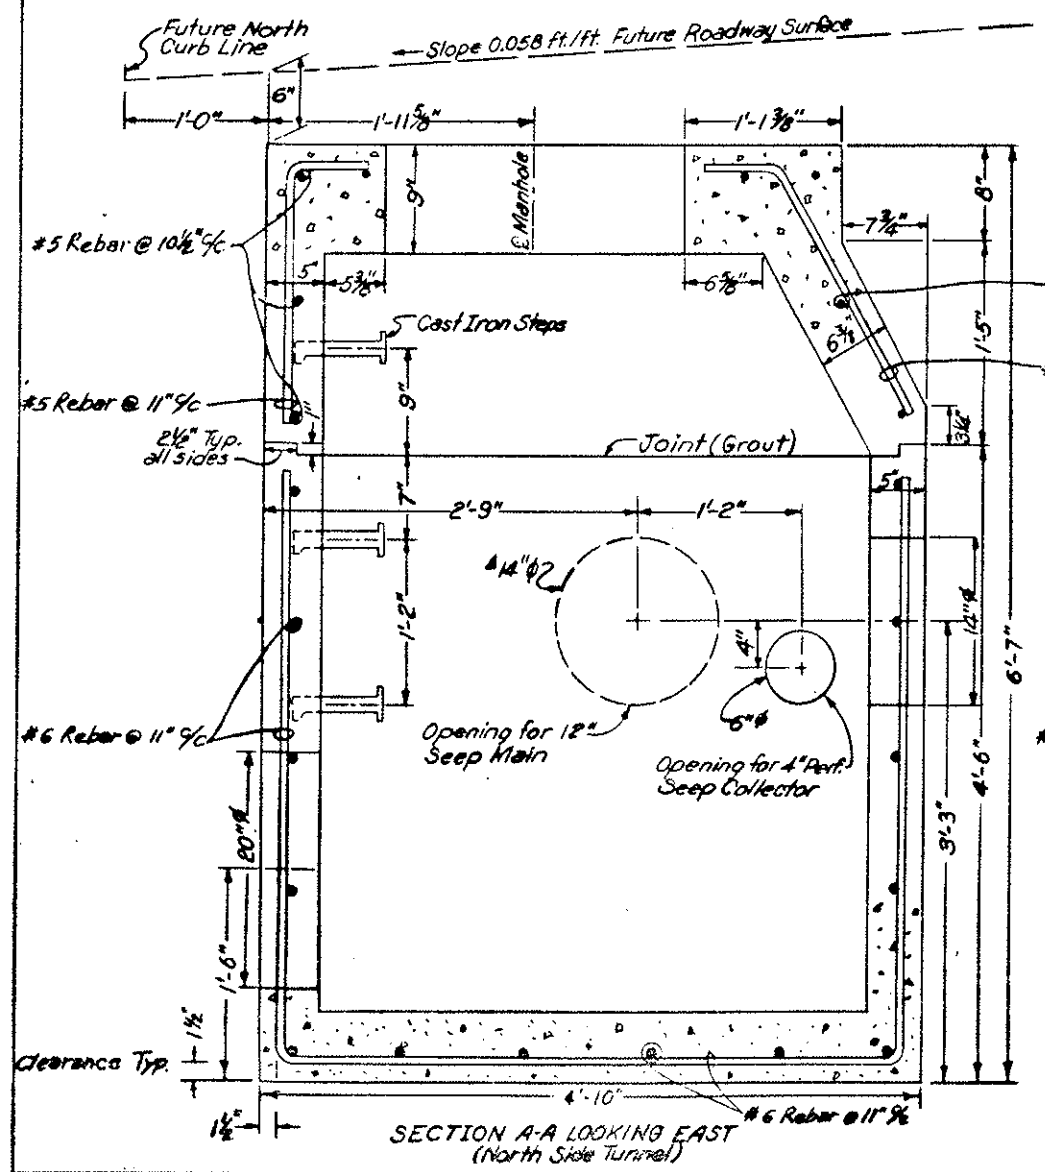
DETAILS OF MANHOLE SPECIAL (TYPE IV)
